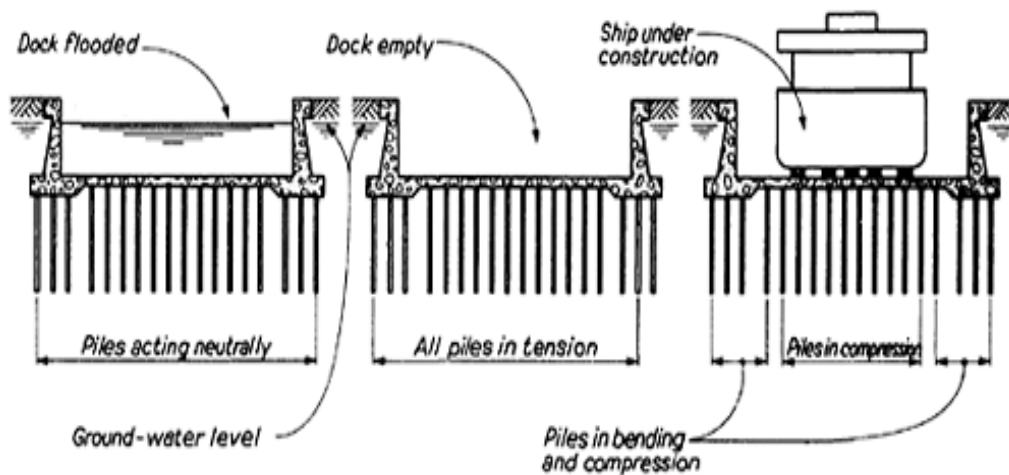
Tension/compression piles beneath floor of shipbuilding dock
